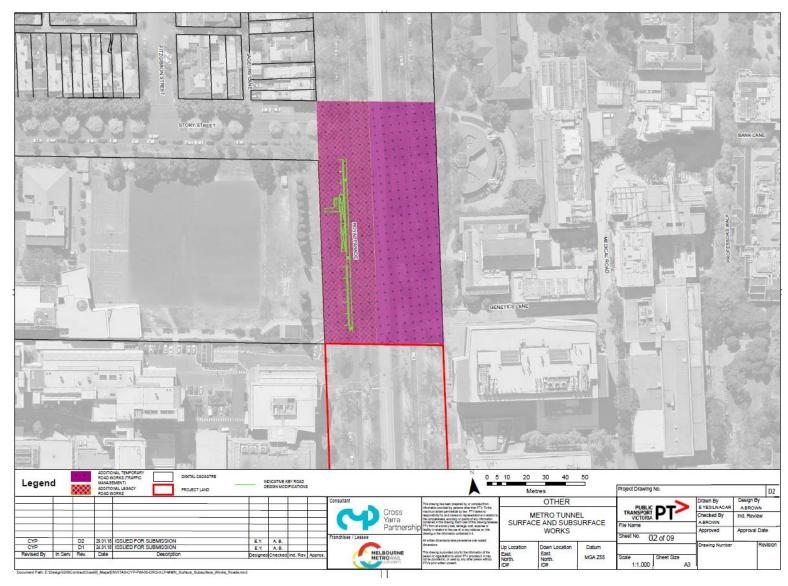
ROYAL PARADE ADDITIONAL ROAD SURFACE WORKS
